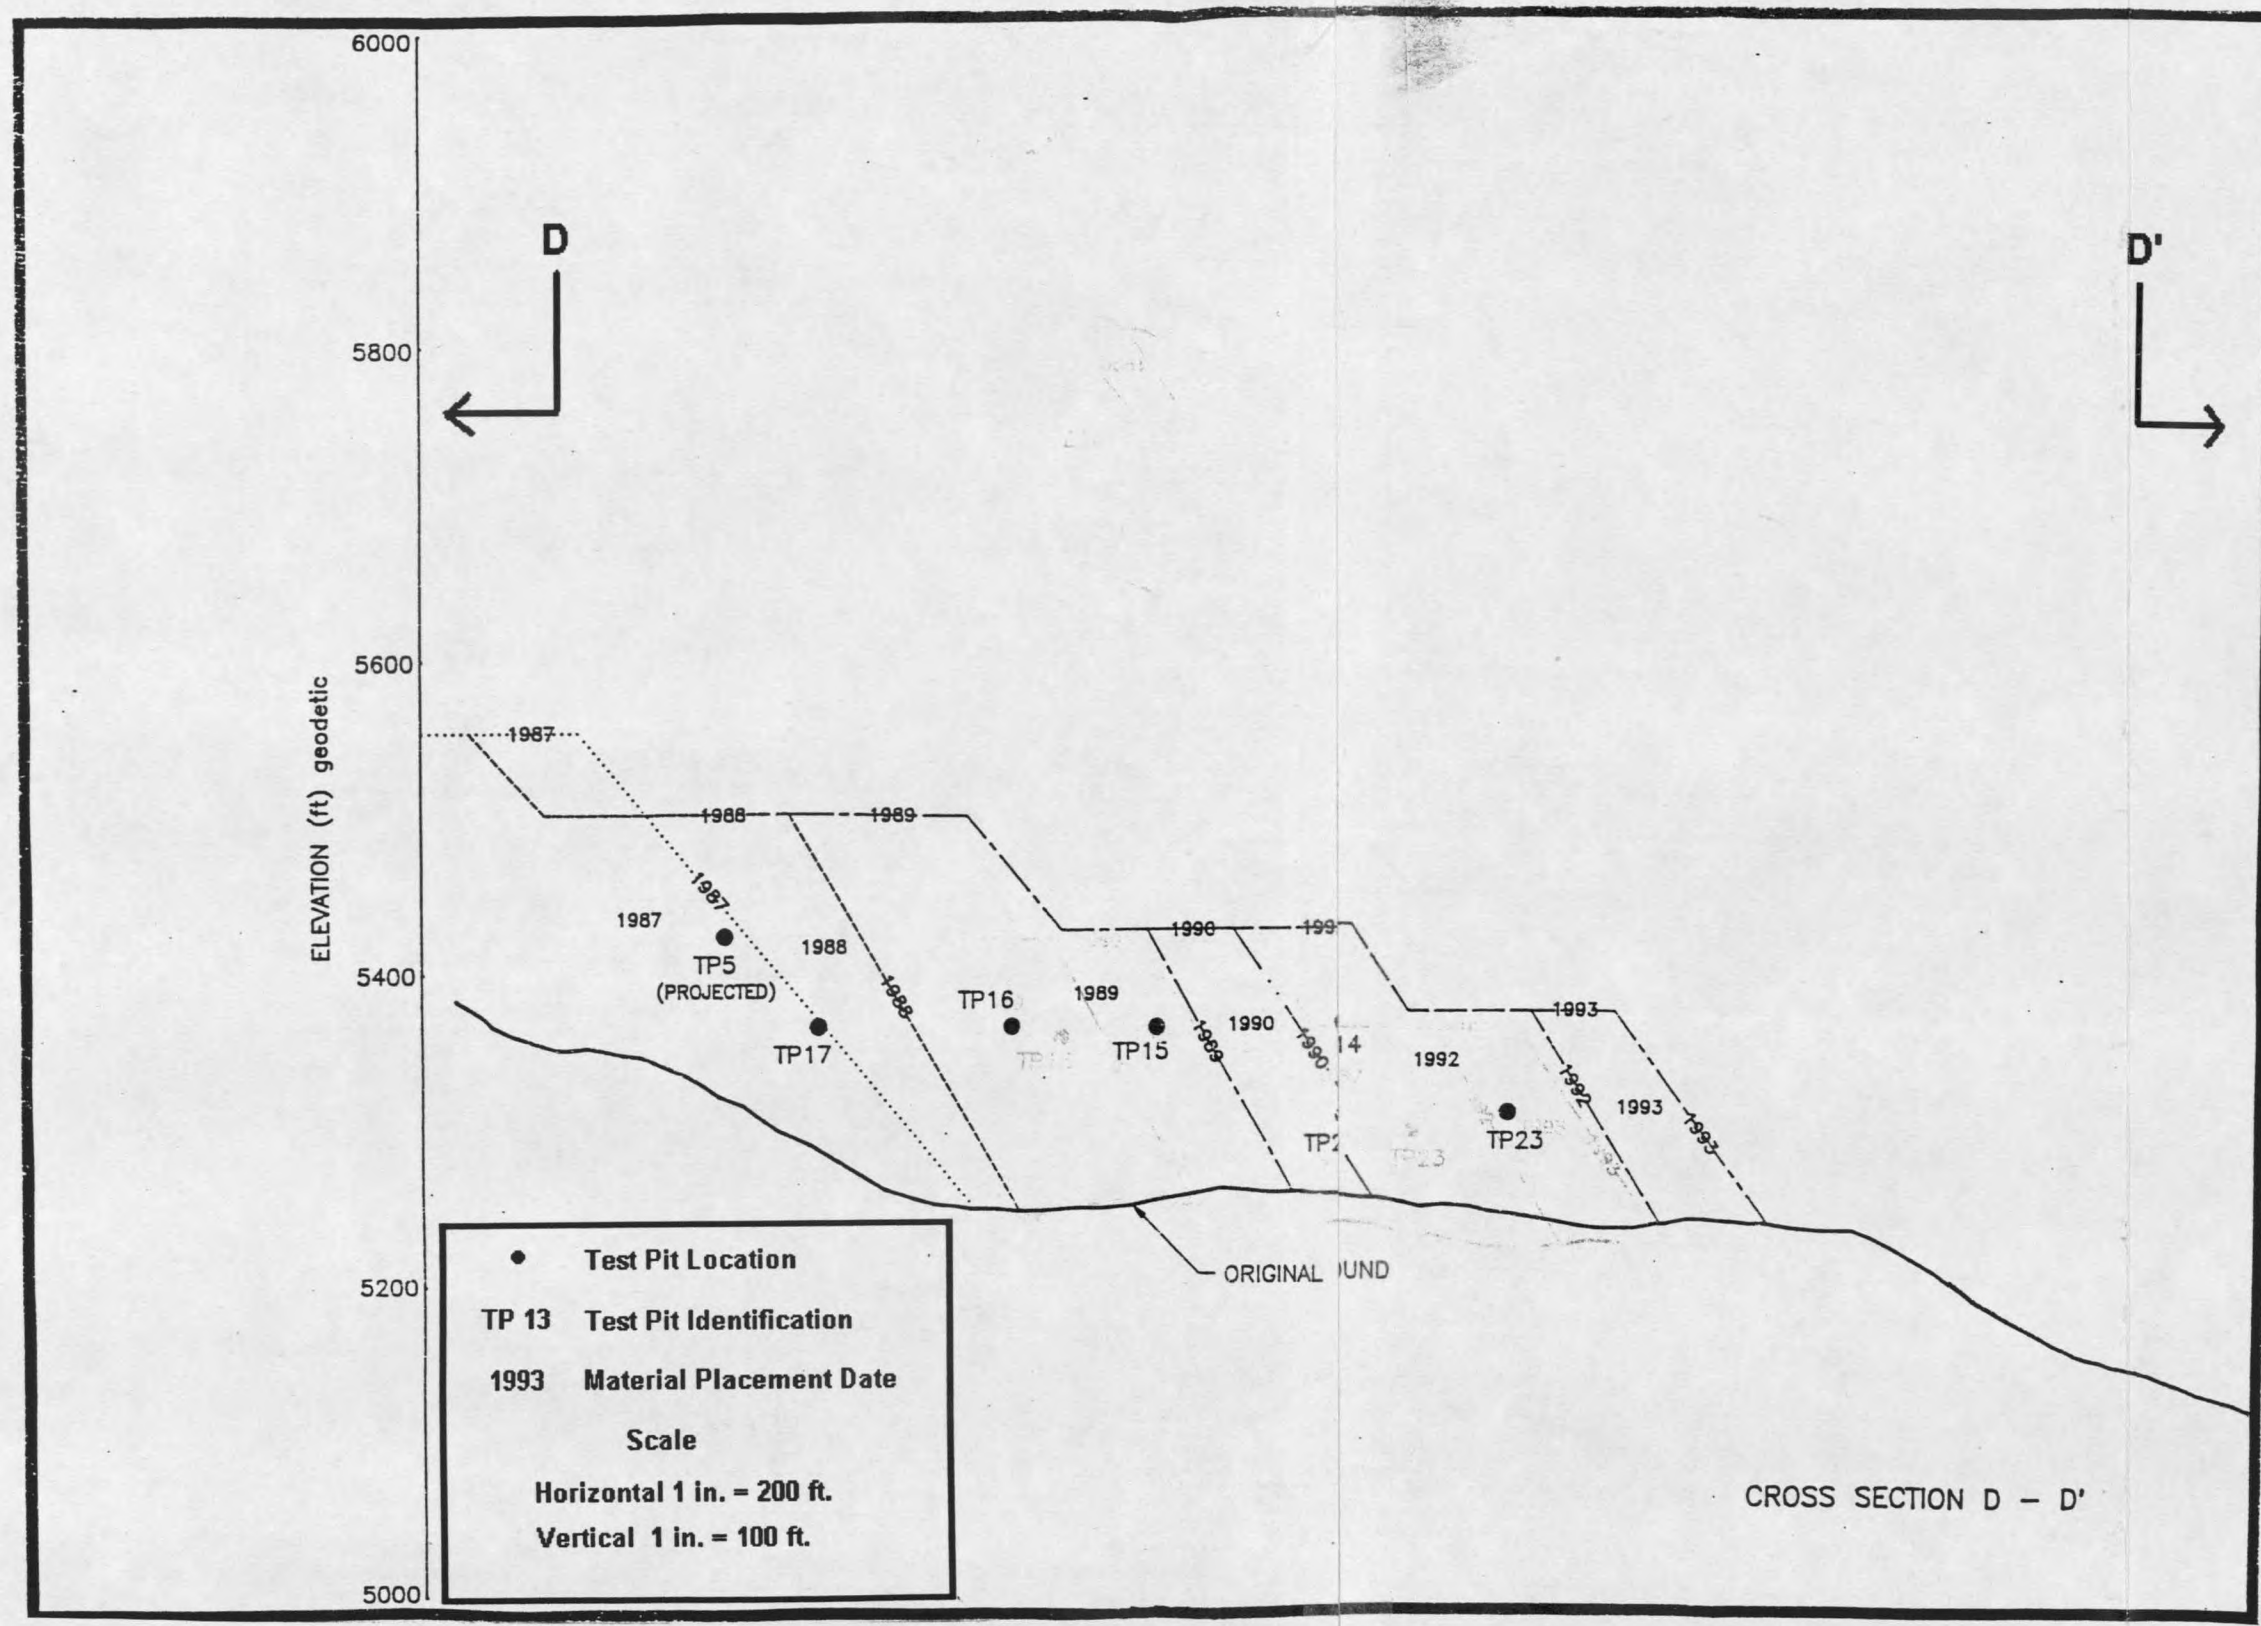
View of waste rock repository vertical plane through cross section D - D'.
